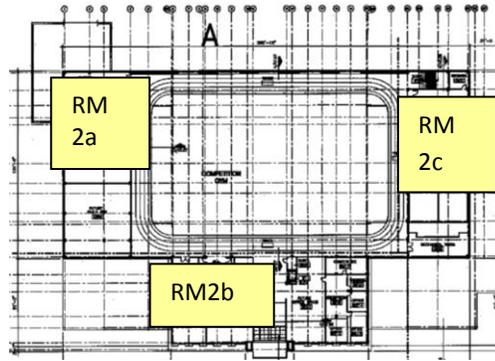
Rec Center 2nd Floor Mechanical Room Locations
